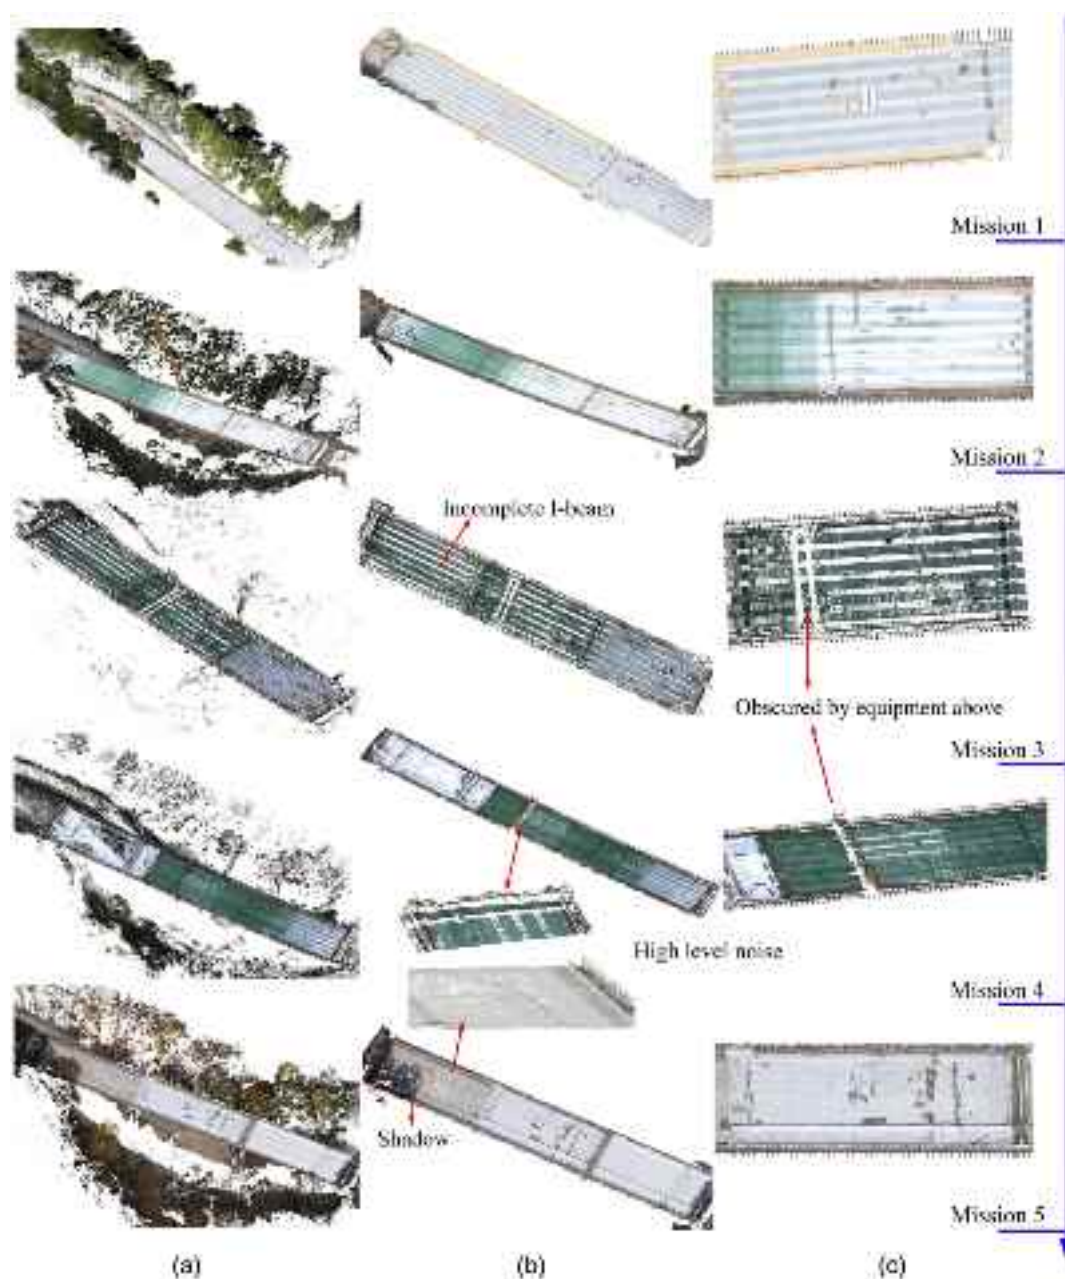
Photogrammetric point clouds: (a) overall view of the construction site; (b) bridge deck; and (c) details of the midspan of the bridge deck.
